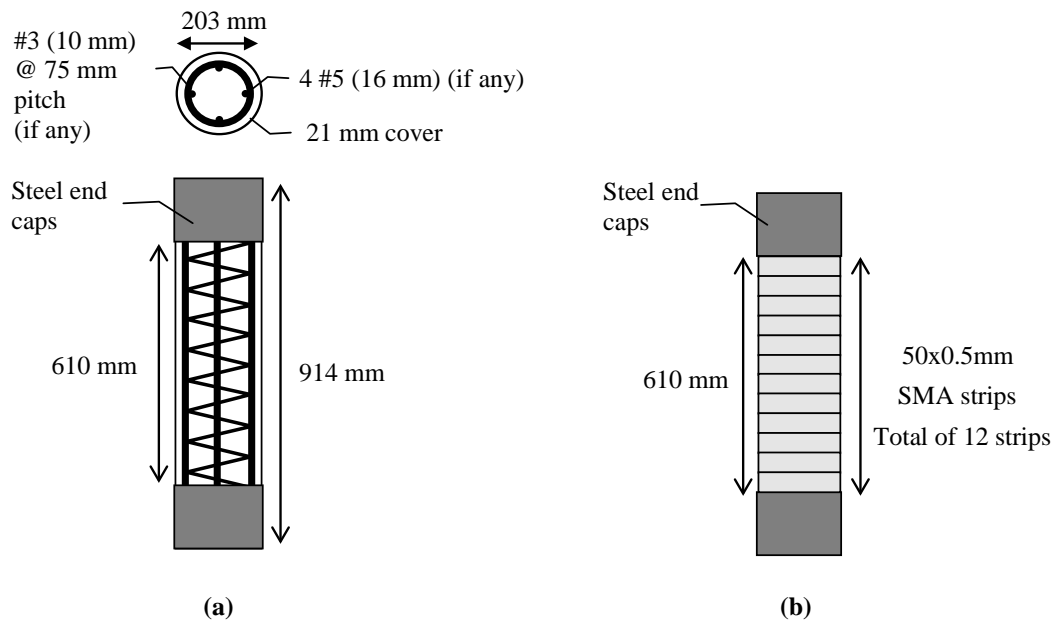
a) Typical column dimensions and internal reinforcement, b) SMA configuration.
